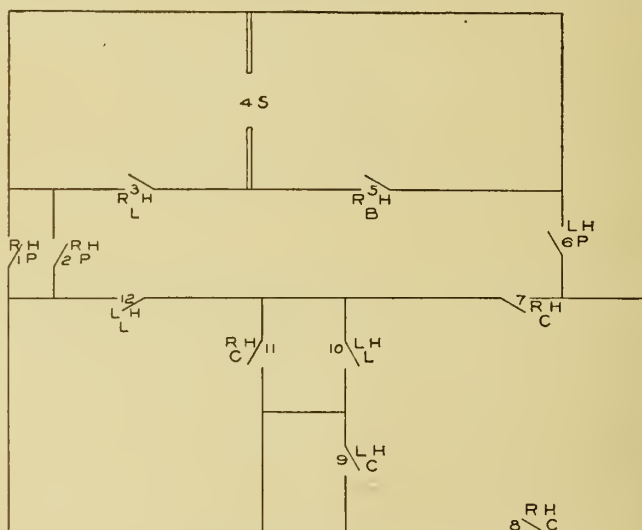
Typical Floor-Plan Showing Location and Swing of Doors.
